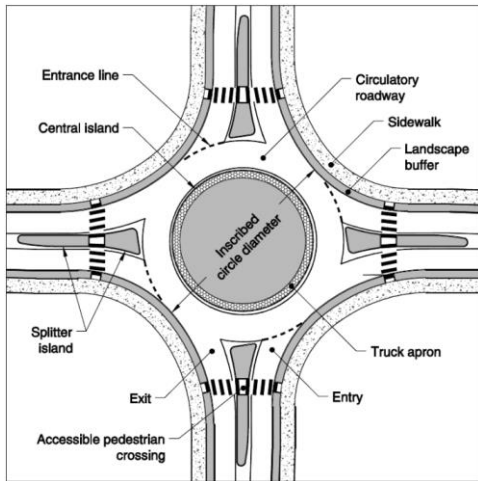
Basic geometric elements of a single-lane roundabout [19]
